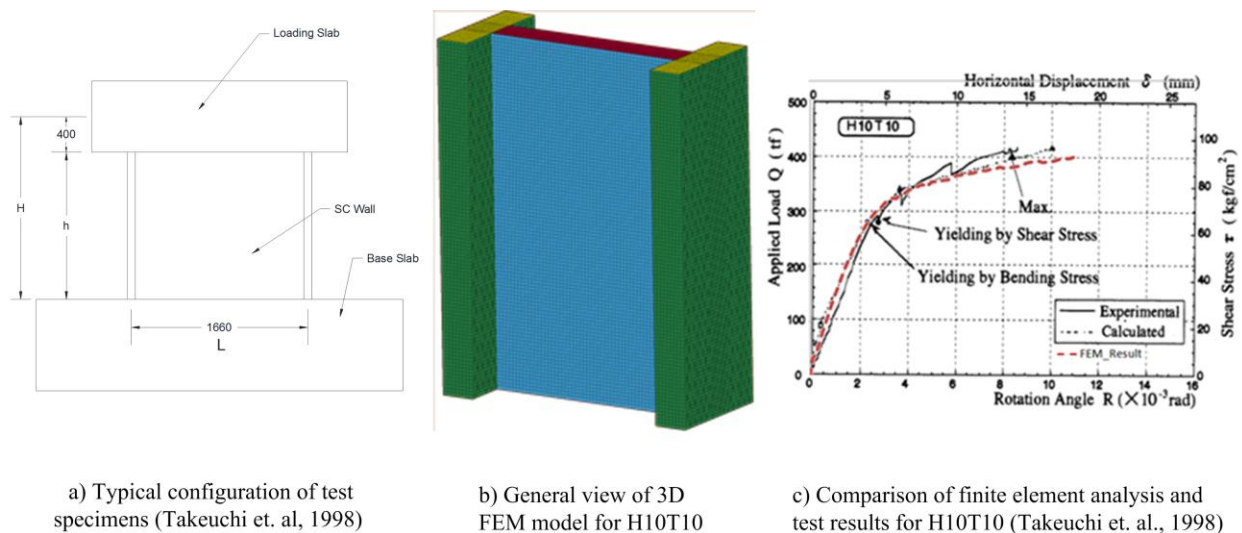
Typical configuration of test specimens (Takeuchi et. al, 1998)
